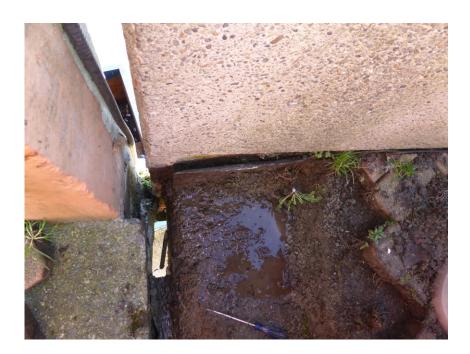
Test #4 located at the joint between the cantilever slab and the exterior stairs.
